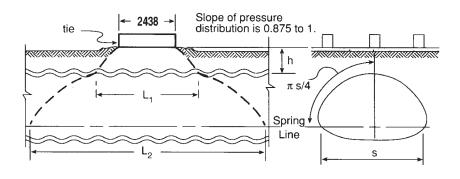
Longitudinal distribution of live load corner bearing pressure in pipe-arches under railway loading.
